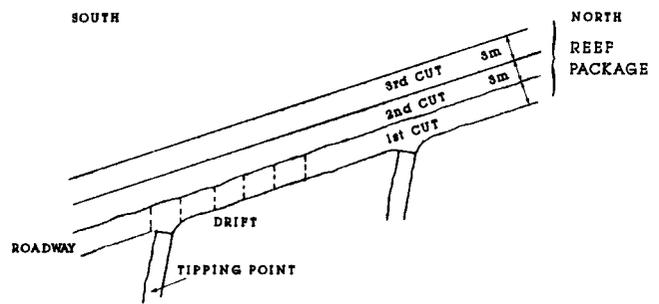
Dip-section view of roadway and drifts for continuous drift-and-fill stoping
